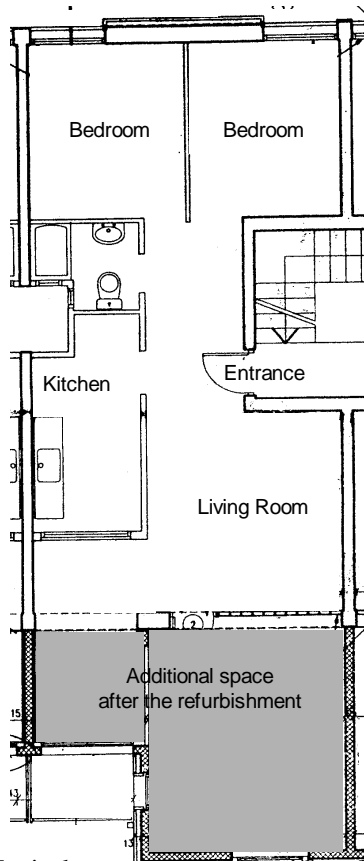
Typical apartment plan with refurbishment addition (shaded).
